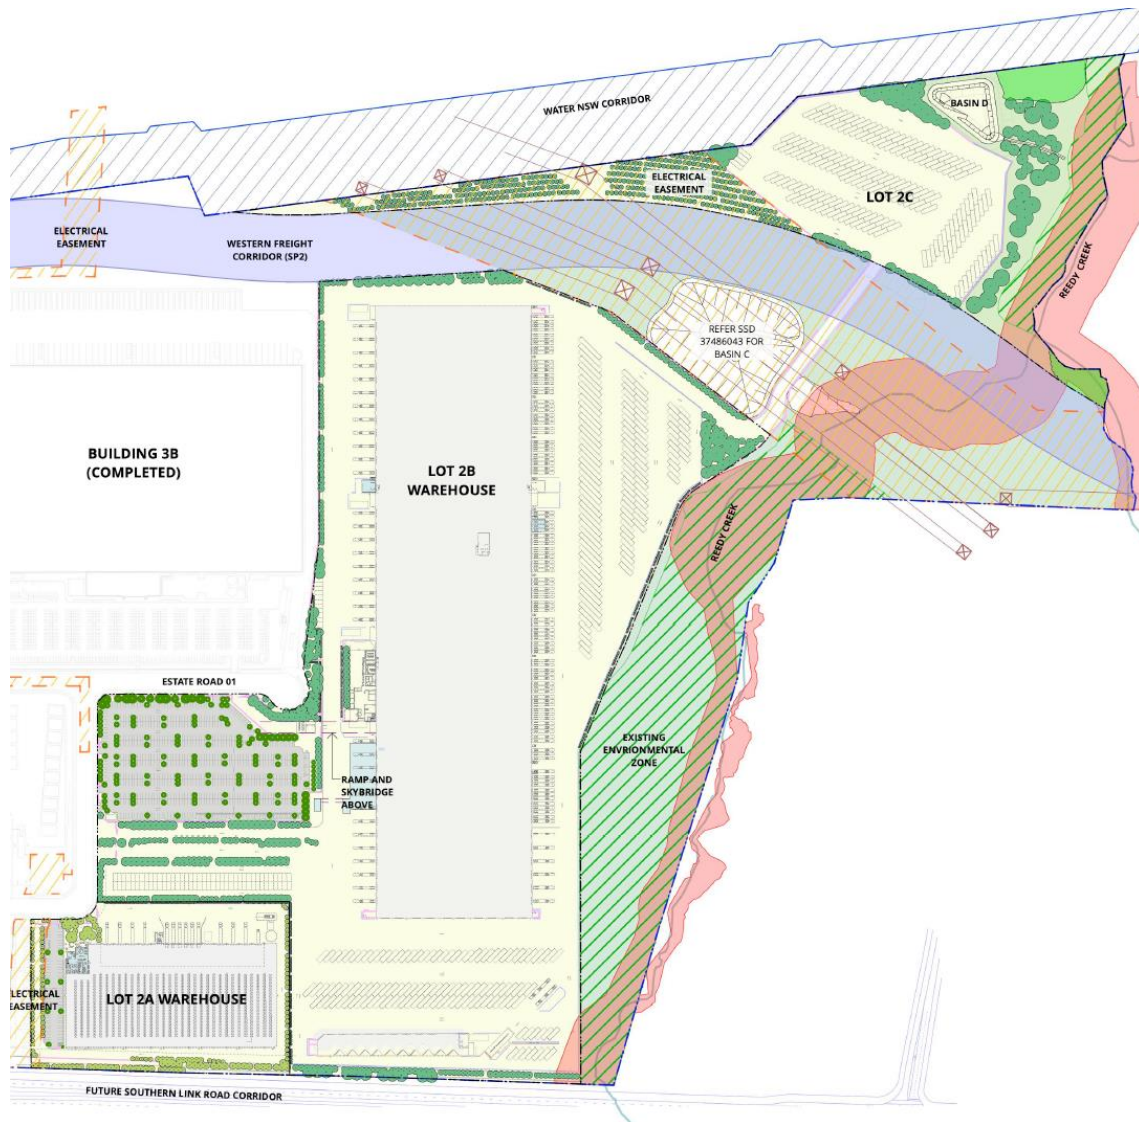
Landscape concept plan - Lot 2B & 2C (Source: Scape)
